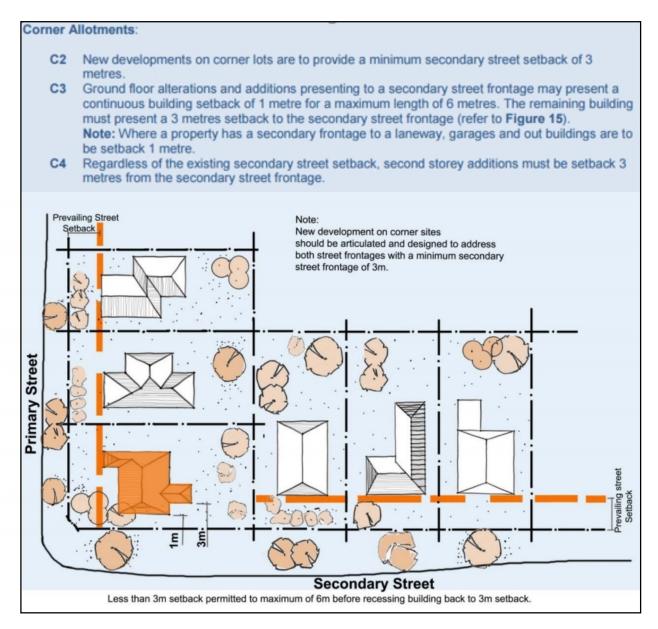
Corner allotment building setbacks - dwelling houses - under BBDCP 2013 Part 4A
